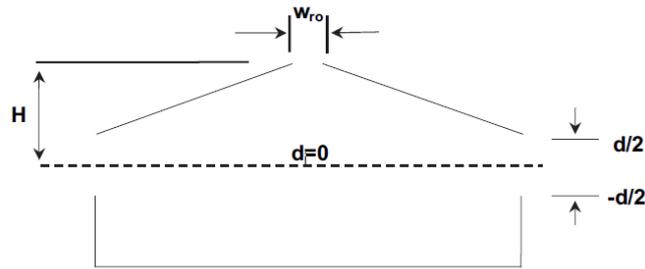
Building's roof pitch and sidewall height of a livestock building (Source: Norton et al., 2010)
